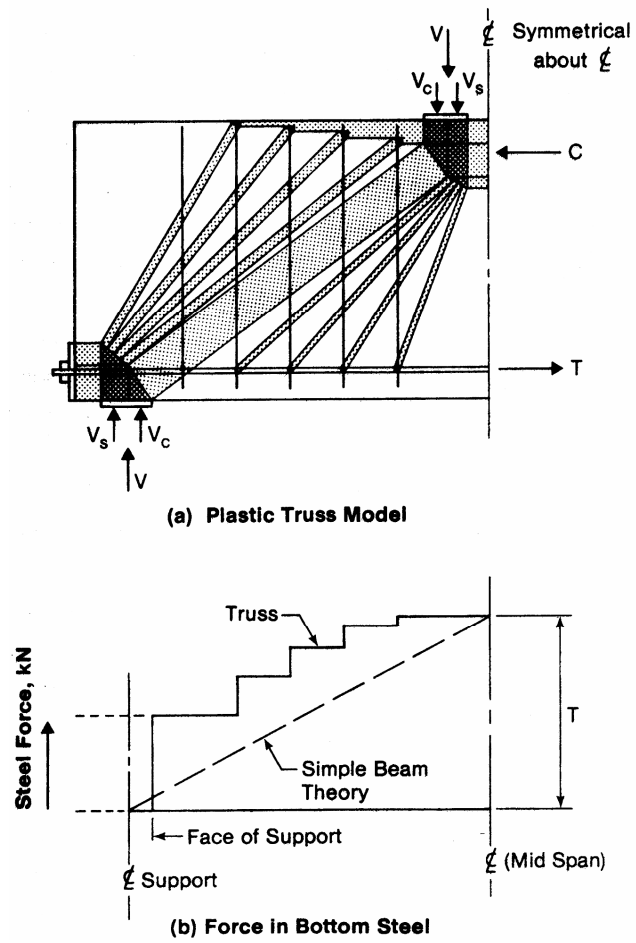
Plastic truss model for beam with stirrups (Rogowsky and MacGregor 1983)
